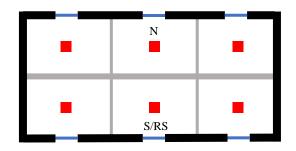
Floor plan of the simulated building. With window positions as small blue lines, heating grid points as red squares, centered north room on 2nd floor N, centered south room on 2nd floor and reference to measurements S, centered south room on 3rd floor under the roof RS.
